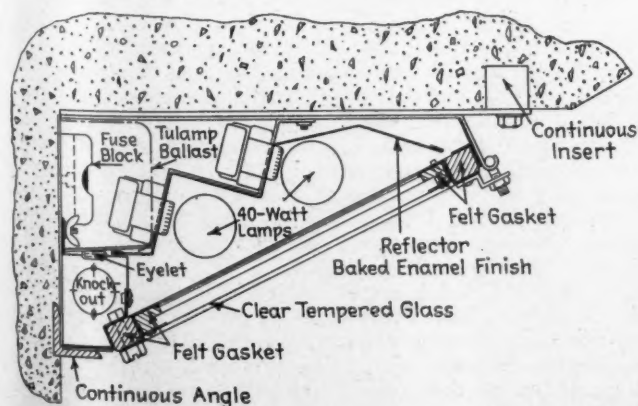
Cross section of mounting of two-lamp fluorescent fixtures under the lower platform
